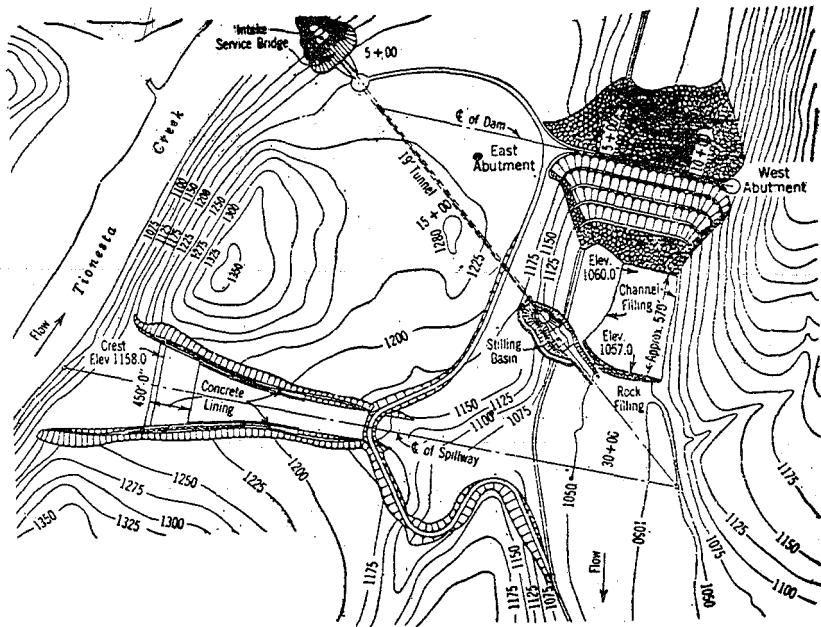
(e) Layout Plan of Tionesta Chute Spillway.
